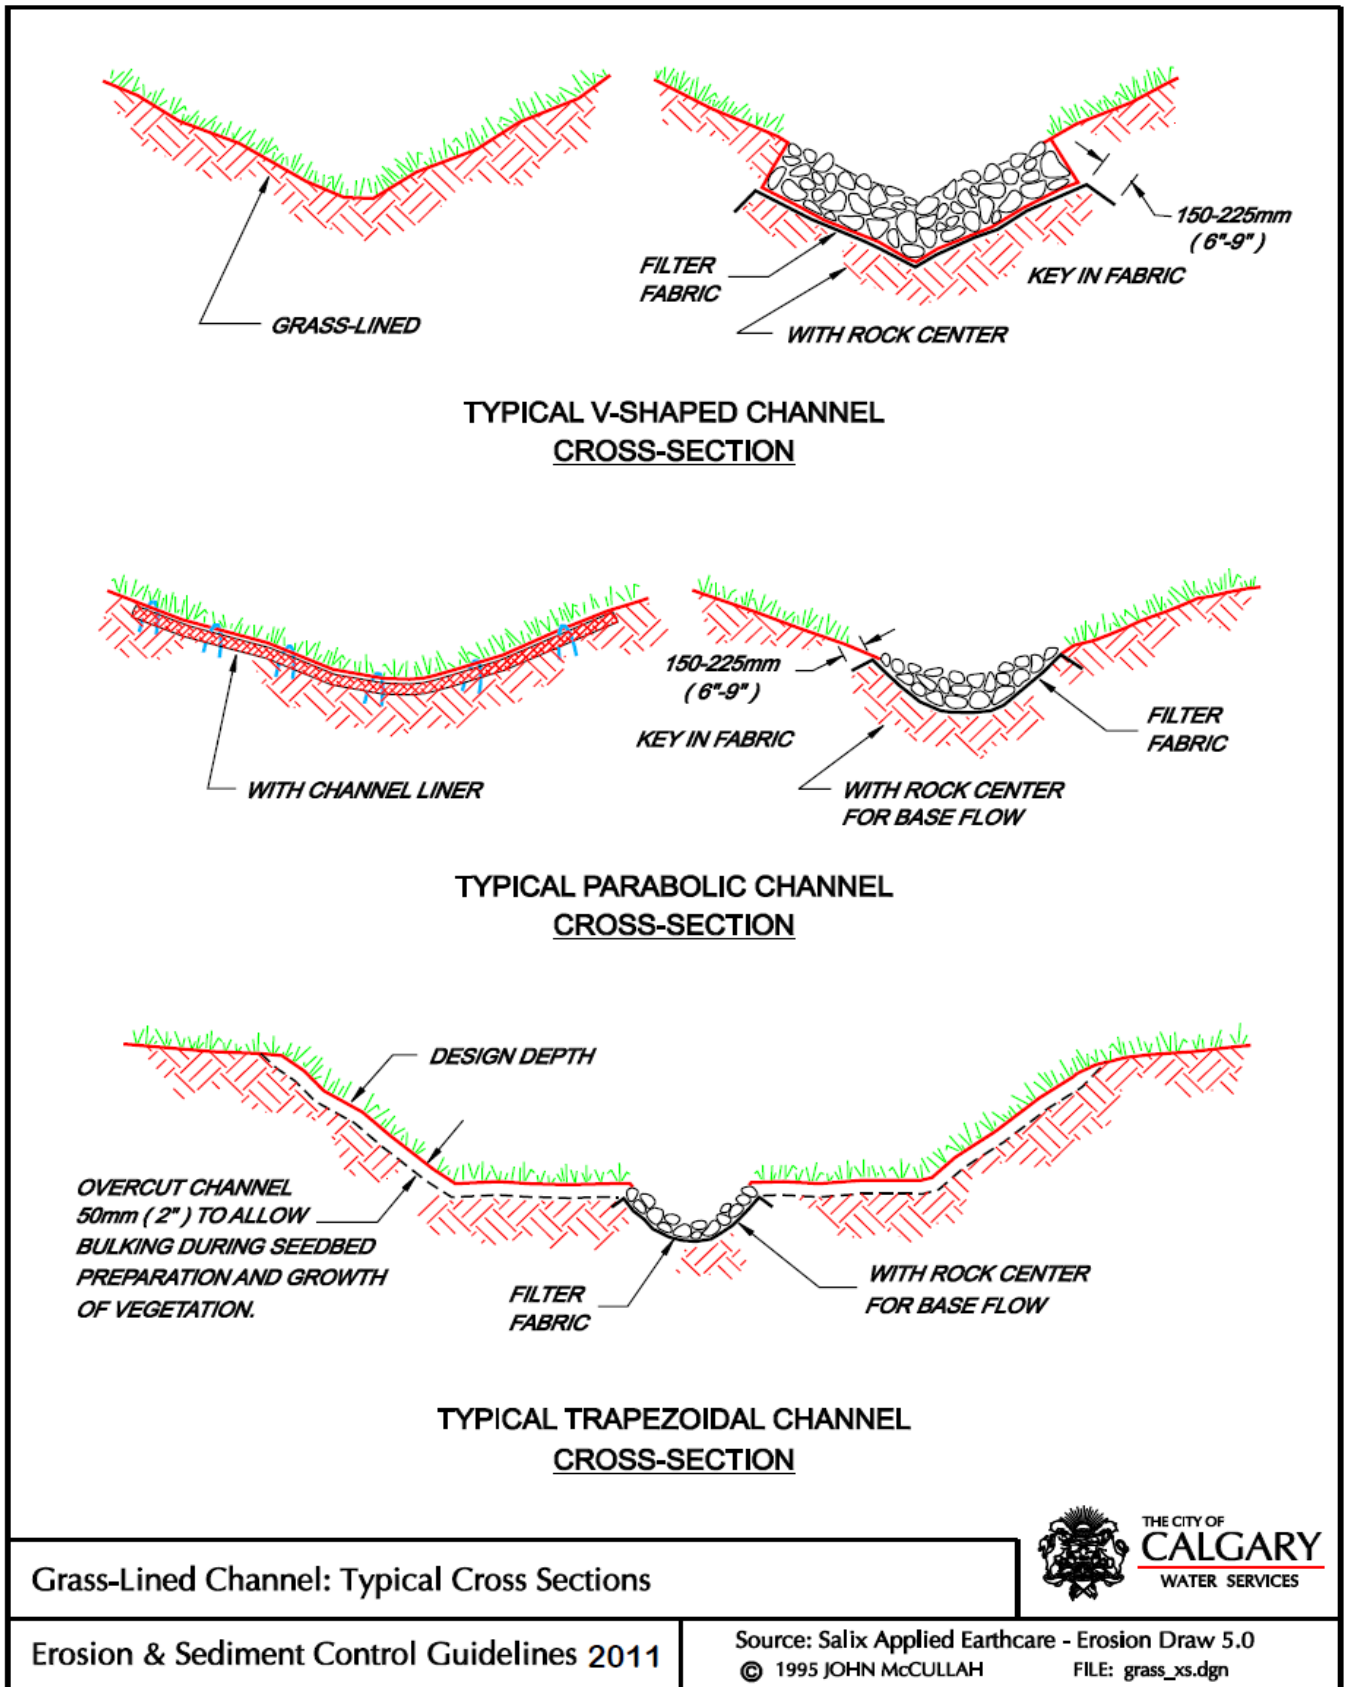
Grass-Lined Channel Cross-Section Detail
